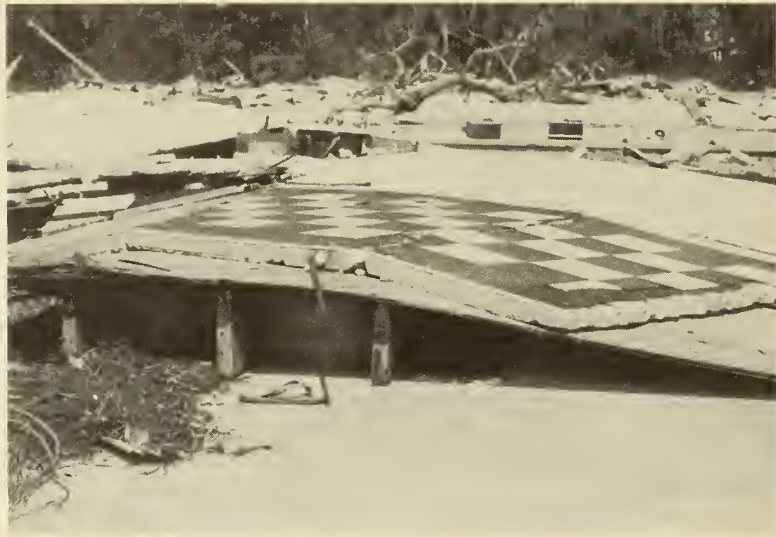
Floor construction used in some apartment buildings, Pass Christian.
